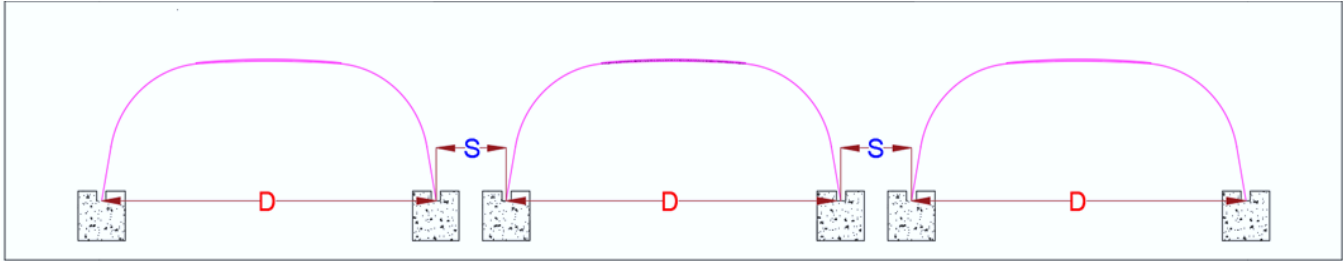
Geometry of three span box-type SSCS with span (D) and spacing (S)
